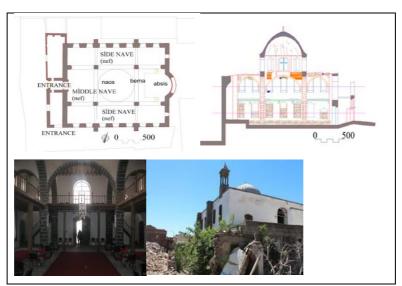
SurpPirgic Church floor plan, sections (DVBM Archive), view of abscissa from the gallery, south façade
